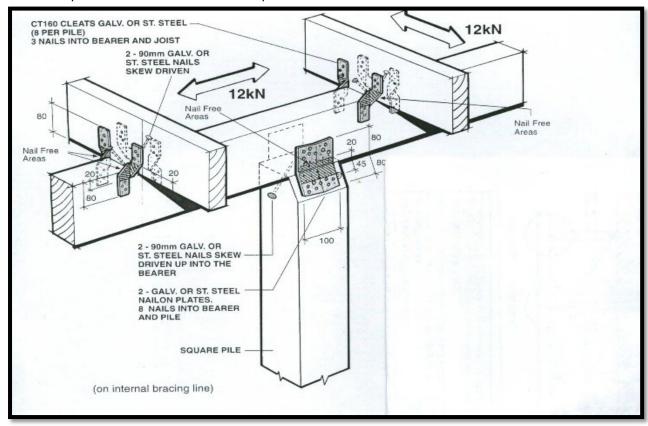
MiTek detail of anchor pile / bearer / joist connections
